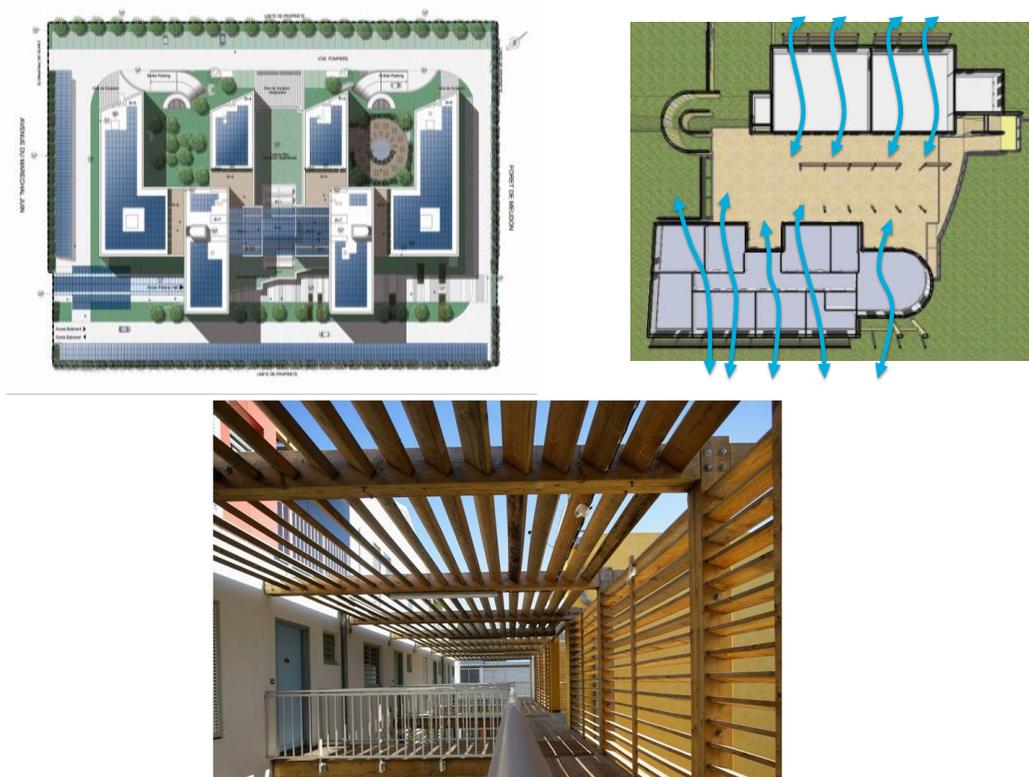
Top left : Green Office Building (outside Paris) – Top right : EnerPos Building (Reunion Island); the width is reduced to use natural resources (wind, sun...) – Bottom center : Ilet du Centre (Reunion Island); exterior walkways are deported from the facade to preserve privacy
